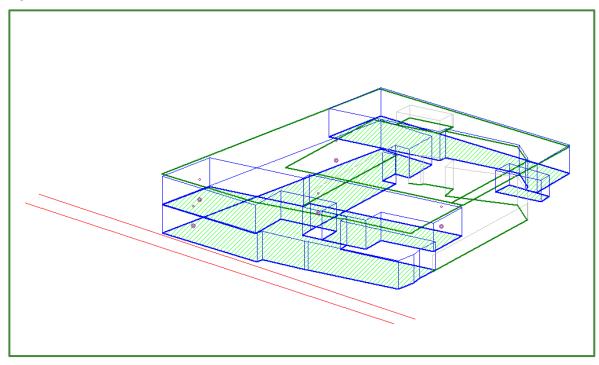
Scenario 4 Road Noise Intrusion with Childcare Centre First Floor Plan Overlay
